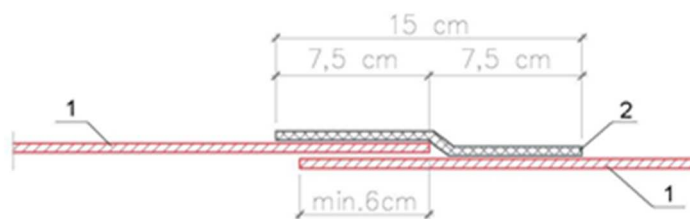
CROSS-CONNECTION OF MEMBRANE STRIPS – CROSS-SECTION
